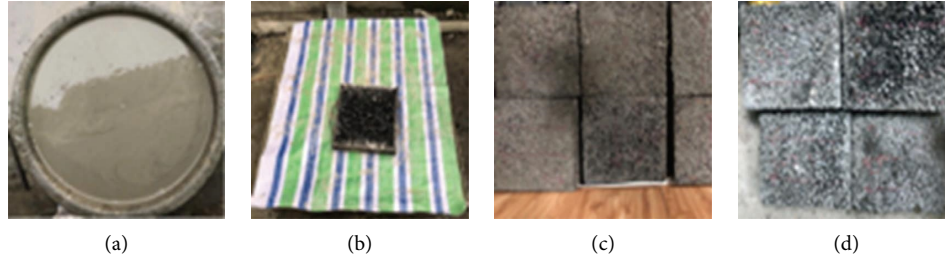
Grouting and formation of specimens. (a) Prepared cement slurry. (b) Grouting on the vibrating table. (c) Rutting specimens after grouting. (d) Rutting specimens after maintenance.
